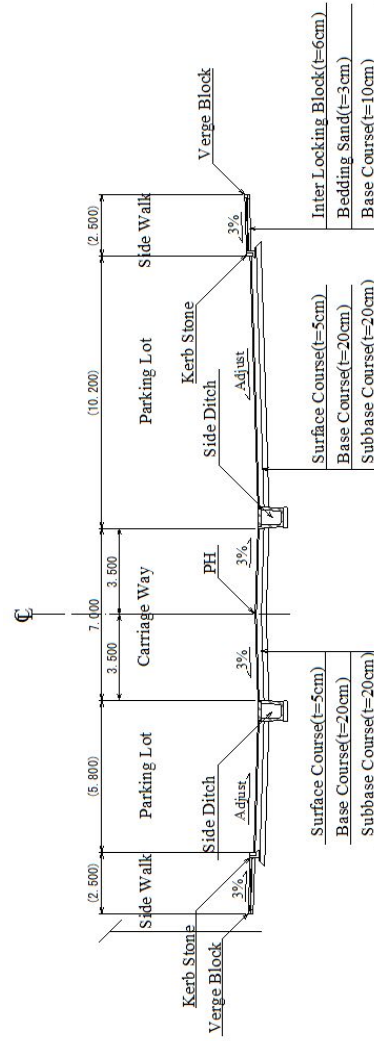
Section-4 (Yianakis RA to Standard Bank IC) Typical Cross Section
